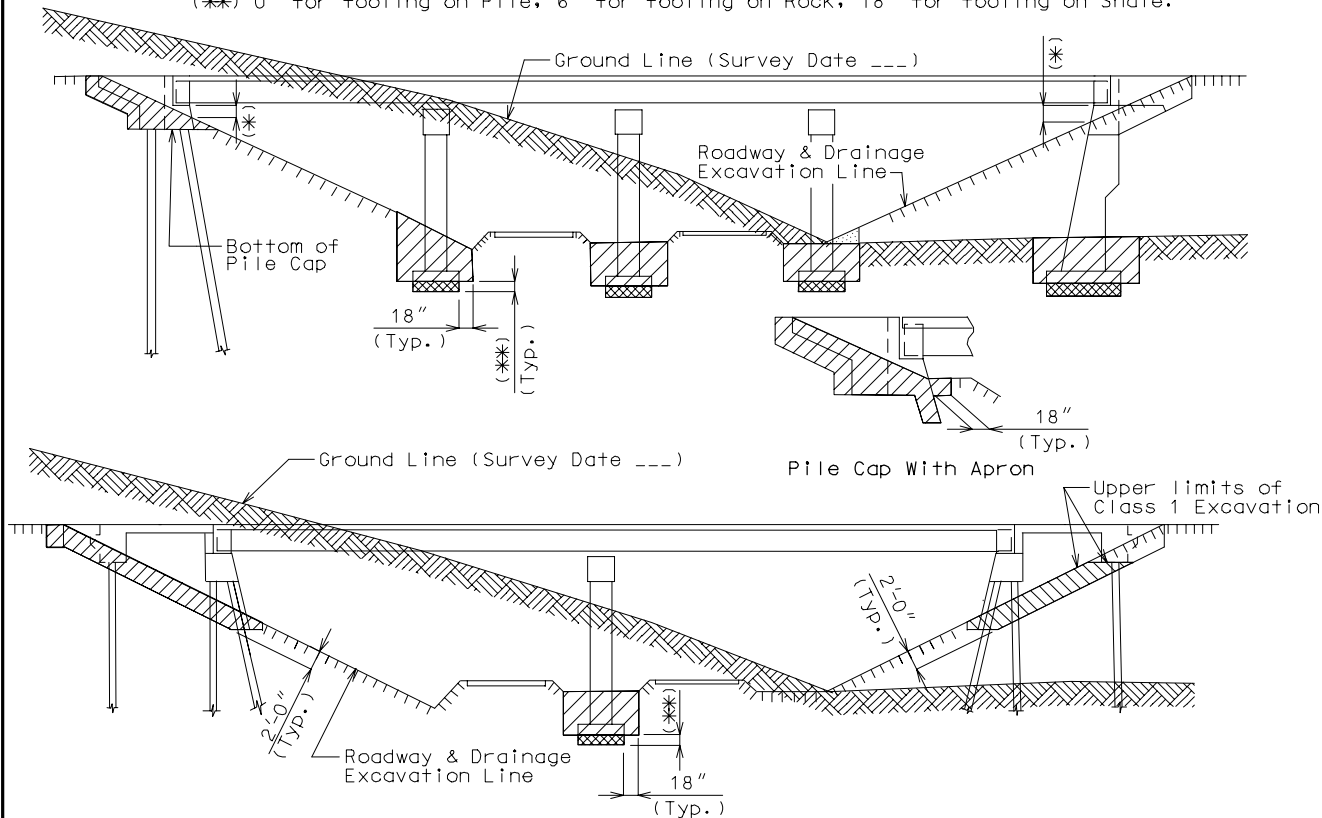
5 Excavation Limits: All Grade Separations
